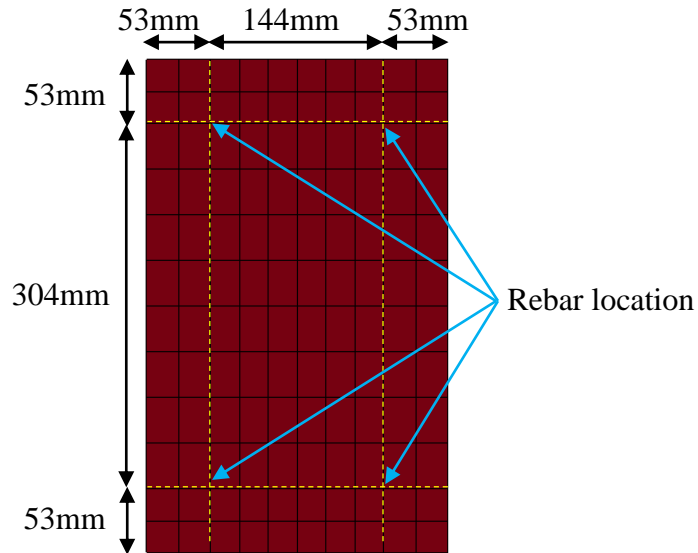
Mesh Size of Beam Cross-Section.
